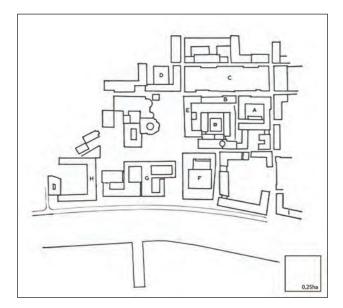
Centre construction plan, 1961. Use of buildings according to plan: A, B residential buildings with shops on ground floor toward Široka Street; H, I residential buildings; C mixed-use (residential, business, commercial, public, service); D mixed-use (residential, business, commercial, public - cinema); E tourist and service; G public and tourist use (archaeological museum); F public (Boltar, 1961, 41)
